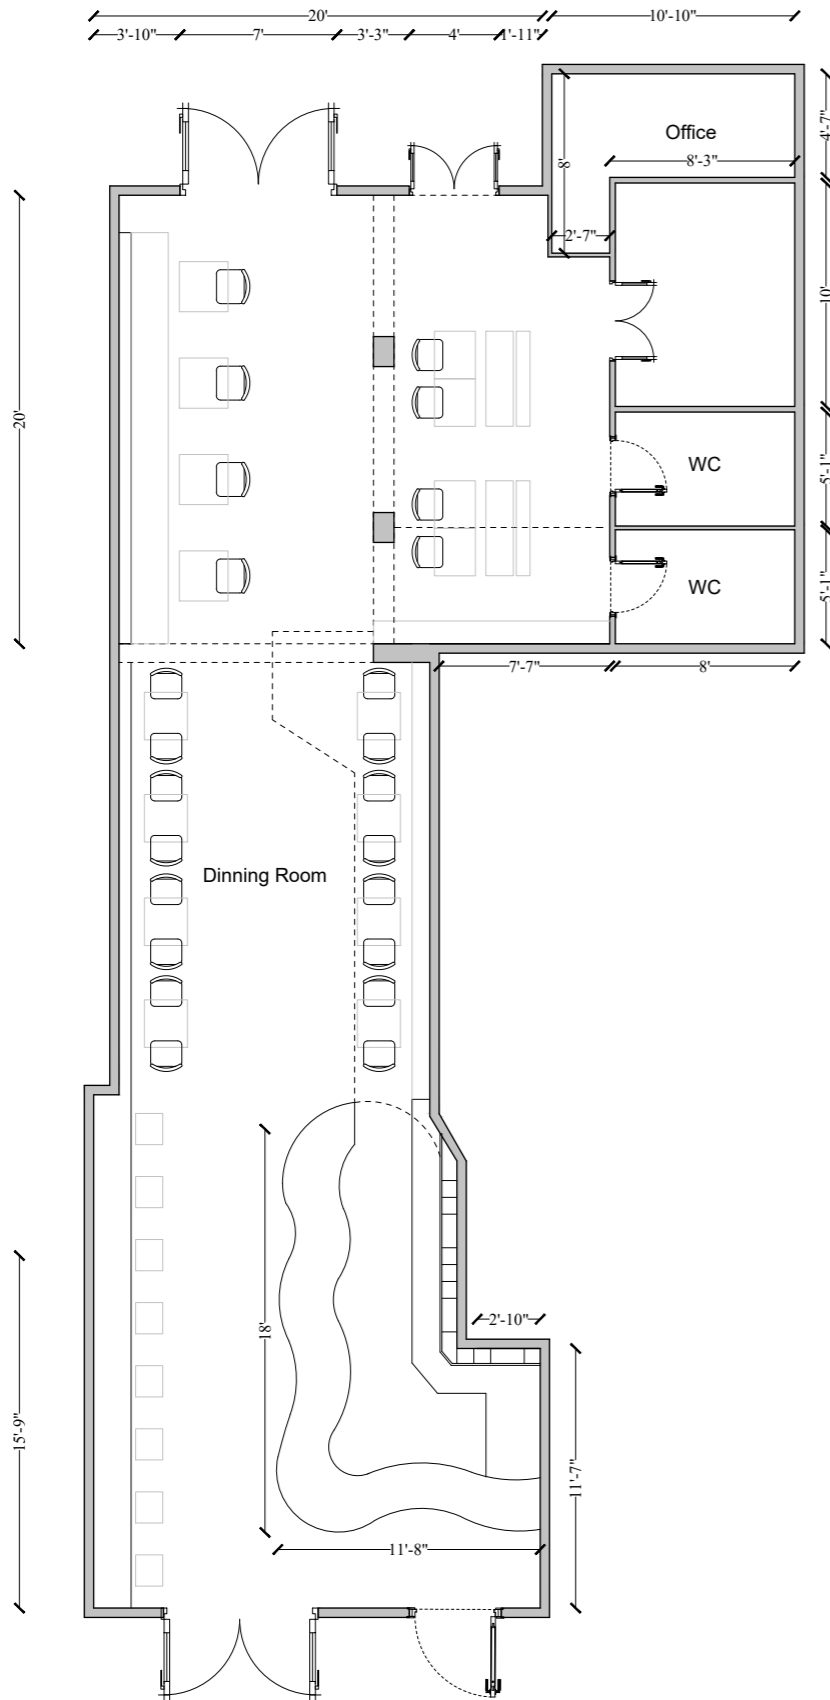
PHOTOS DO NOT REFLECT ACTUAL SEATING ARRANGEMENTS & FLOOR PLANS
